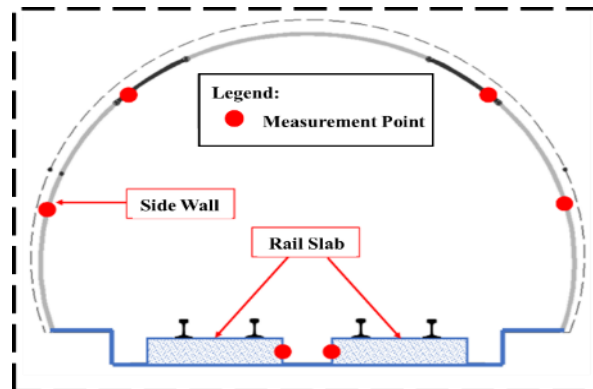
Future development of tunnel deformation monitoring system by deploying bending gauges on tunnel walls and rail slabs
